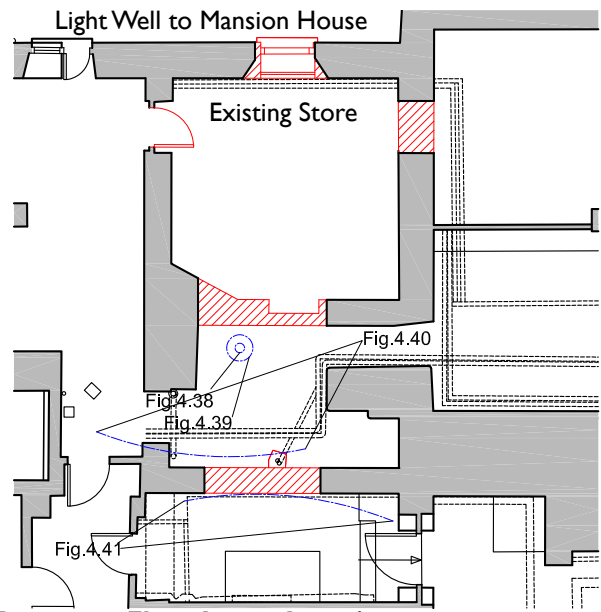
Northern external wall of basement where the new door insertion is to take place
